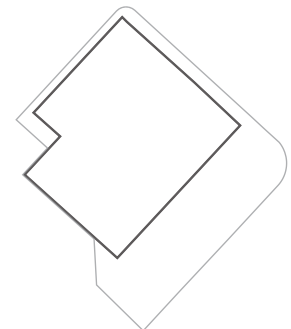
Underground construction area (dark outline) and expanded area (pale outline).
